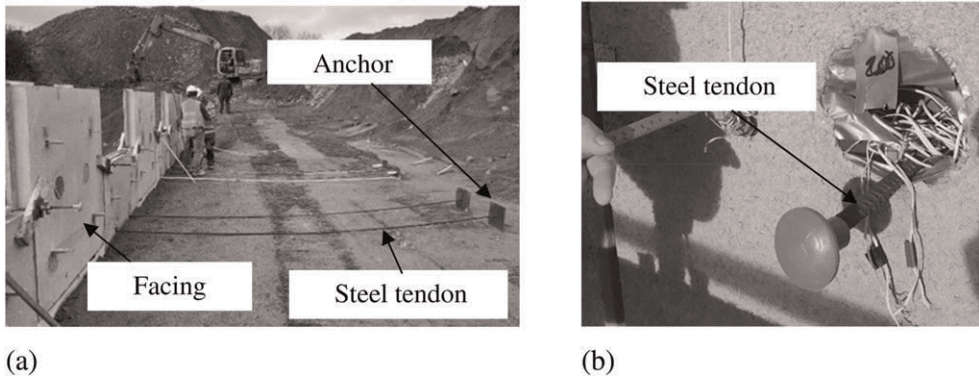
(a) Construction of test wall, including installation of anchors and (b) Anchor tendon protruding at face of wall through preformed hole in facing panel.
